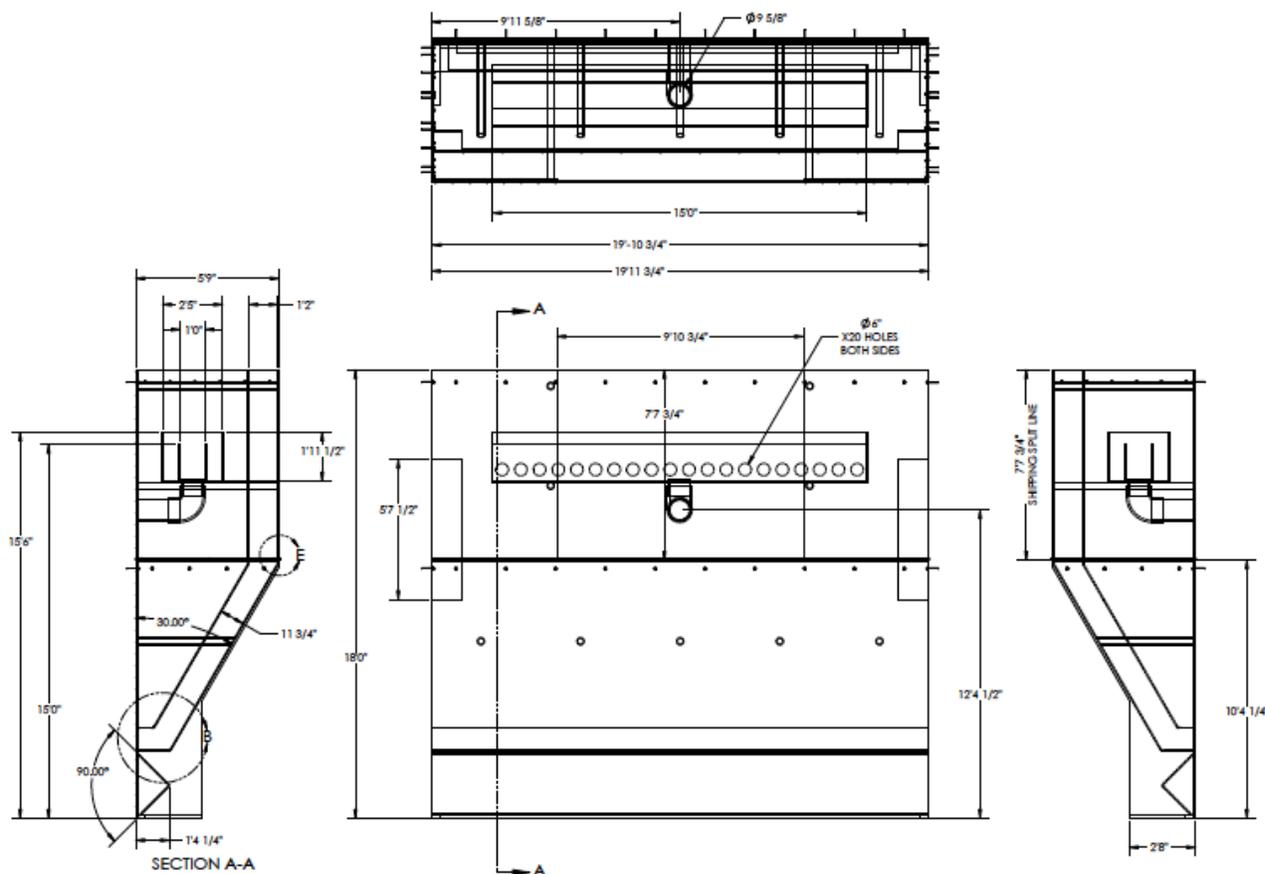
View of the Settling Zone from Top, Front and back sides. To be anchored to outside and back concrete walls.
